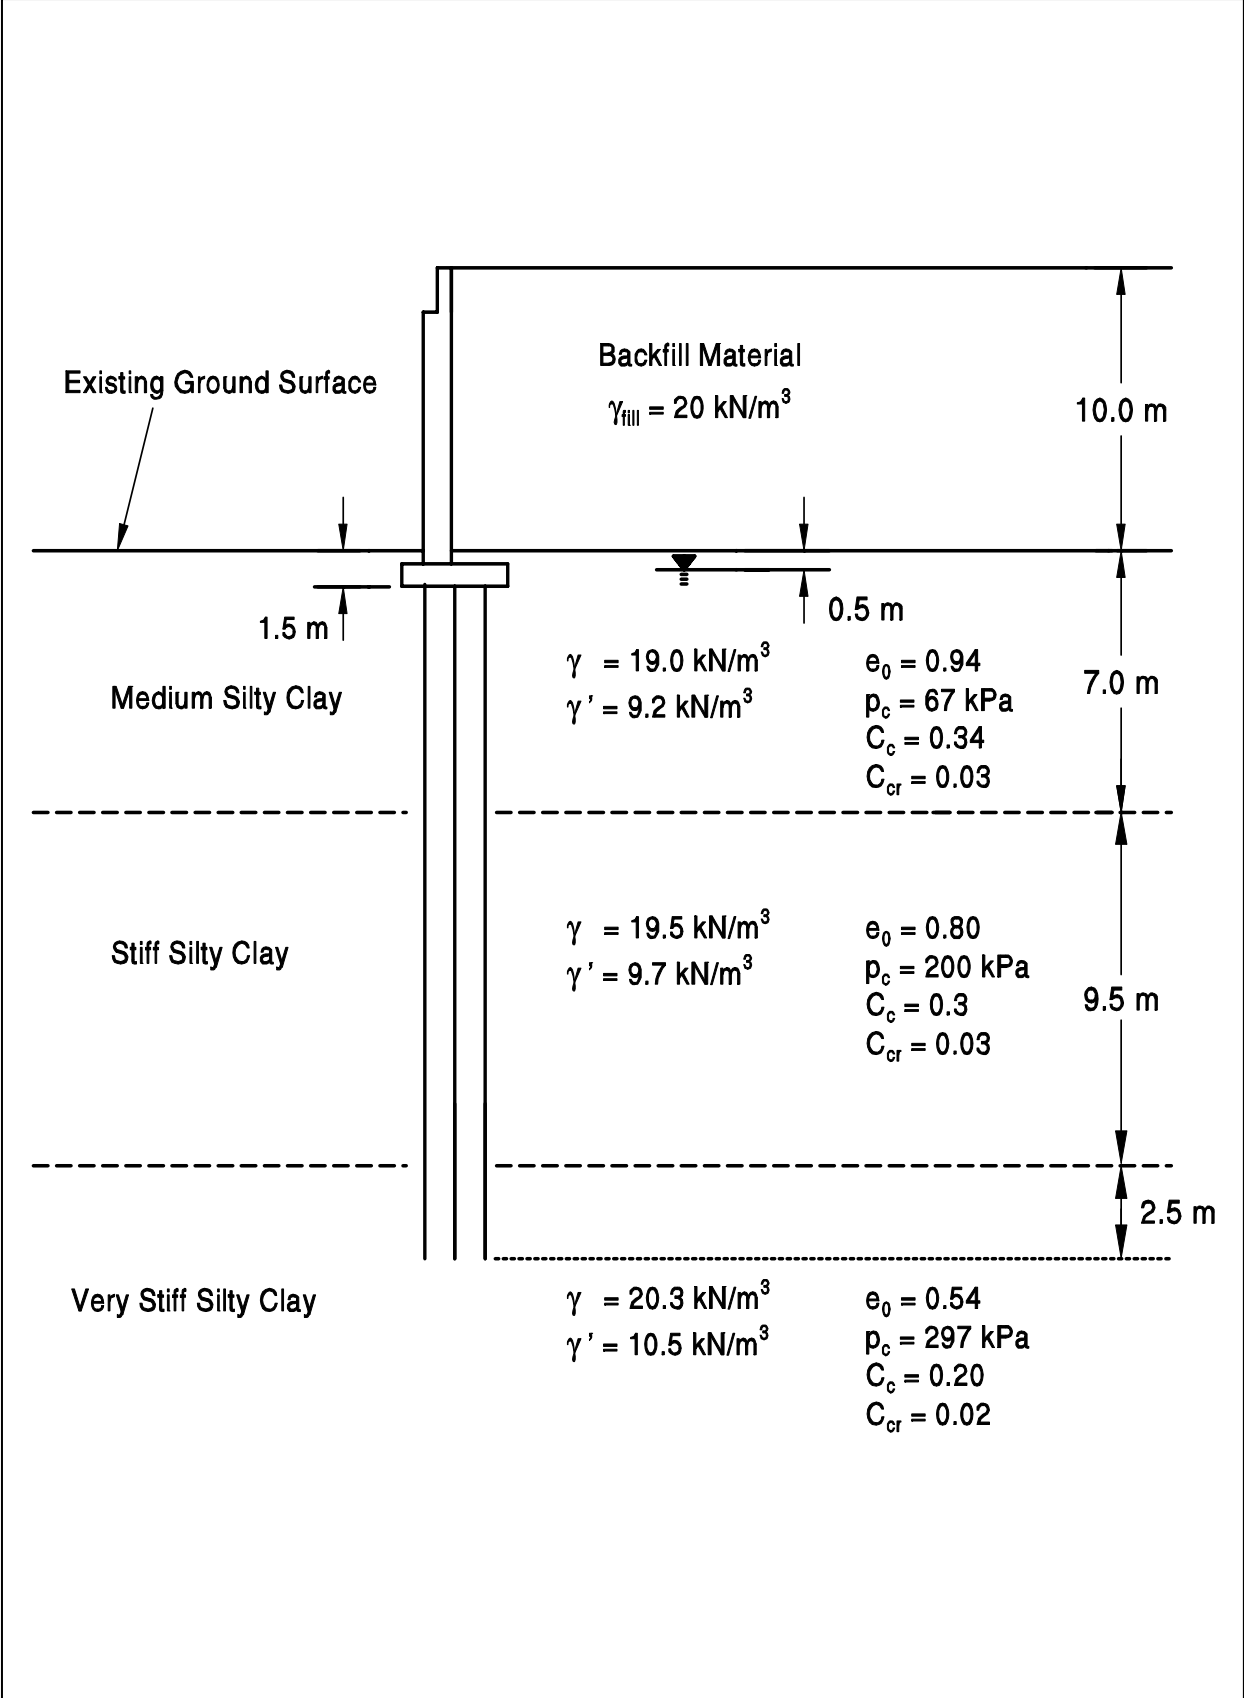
Schematic of South Abutment Showing the Backfill Material and Soil Profile
